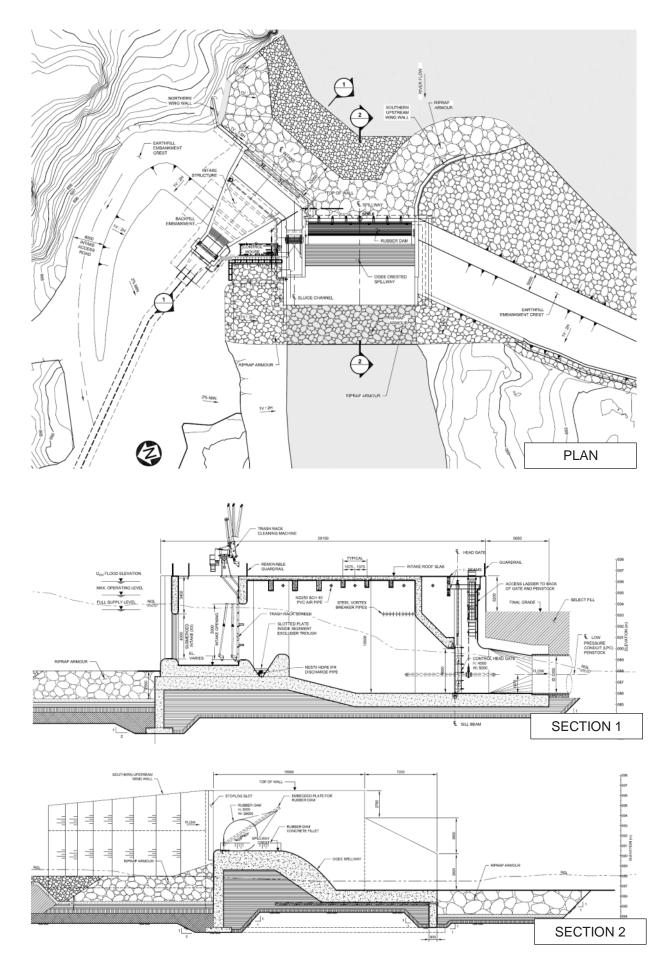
Reservoir De-sander Type Intake – Plan and Sections
